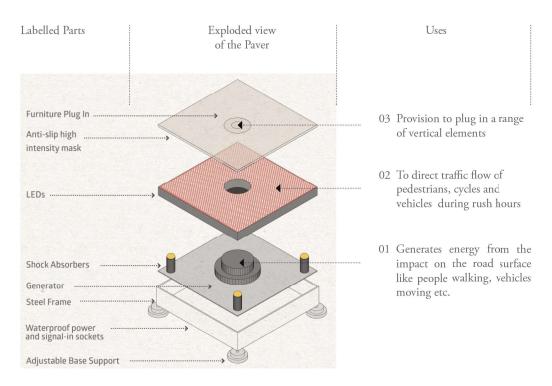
Exploded Axonometric Showing Details of the Paver
